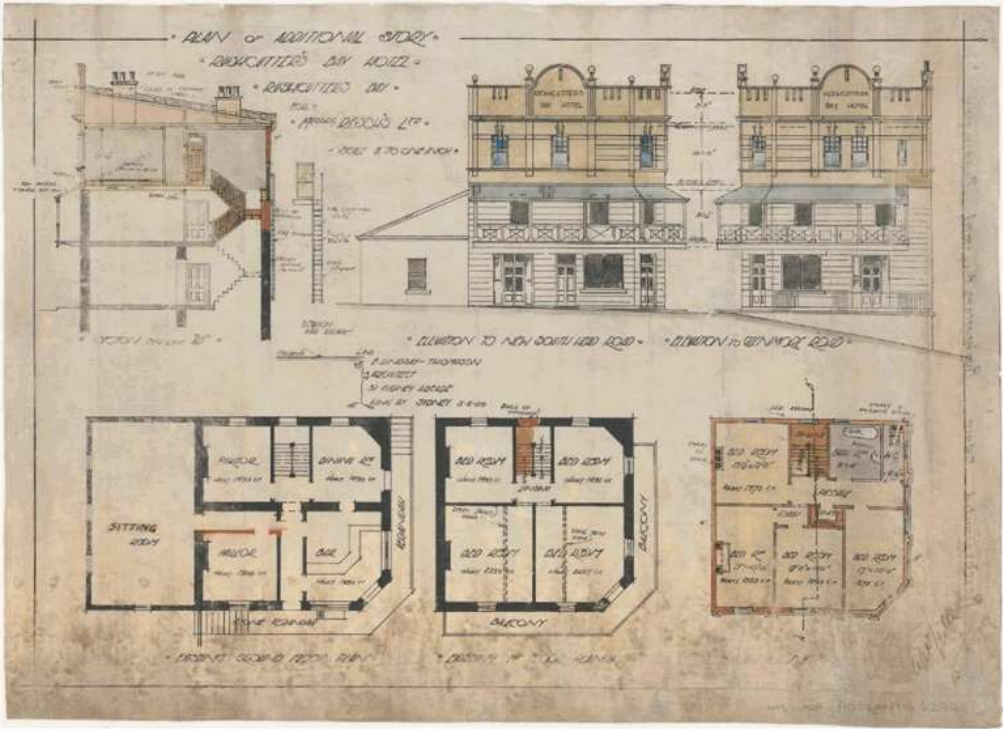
Plan of the additional storey to be added to the hotel by E Lindsay Thompson, May 1909. (Source: State Records and Archives NRS-9590-1-[Plan62948]-[342])
